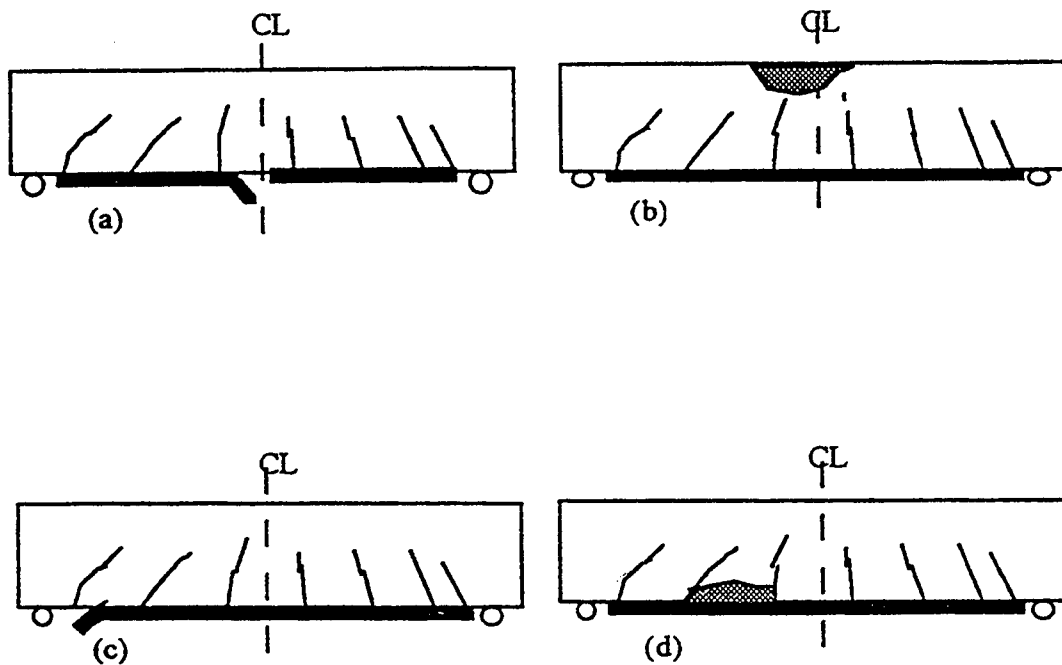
Different Failure Modes in RC Beams Strengthened with FRP Plate
